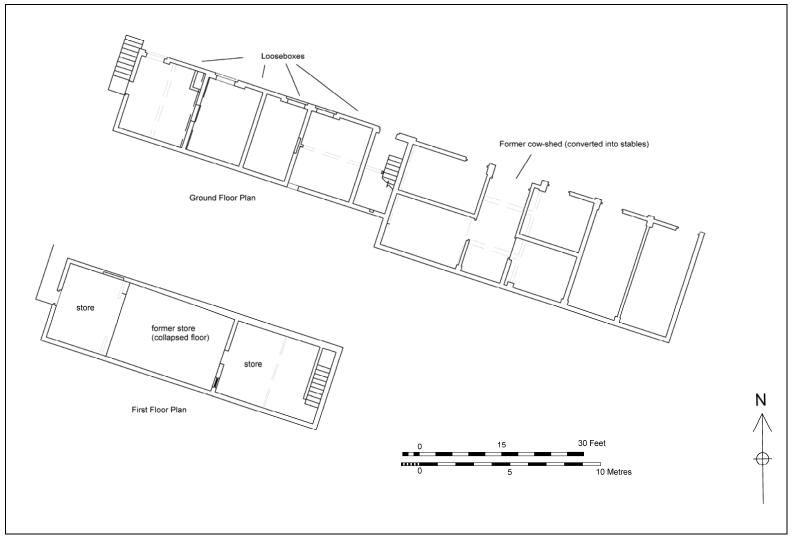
Range B Floor Plans (derived from plans supplied by Greenhatch Building Surveys Ltd).
